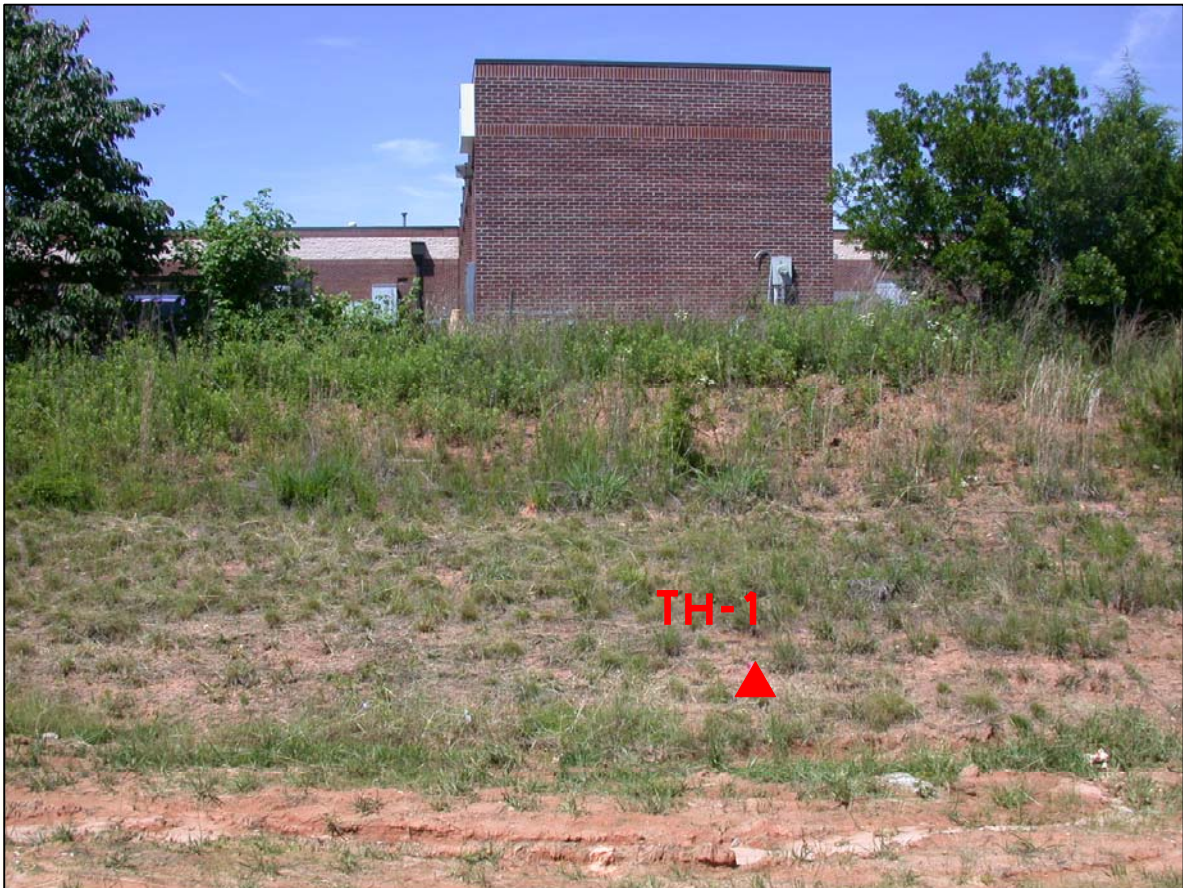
BORING IN R/W LOOKING NORTHEAST
